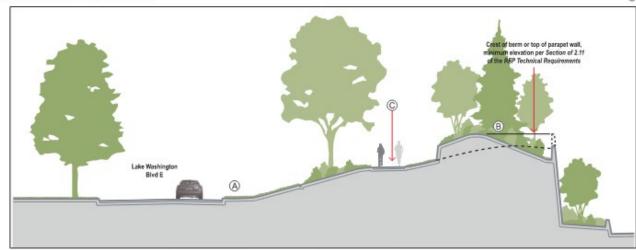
E Lake Washington Blvd east of 24th Ave E section
